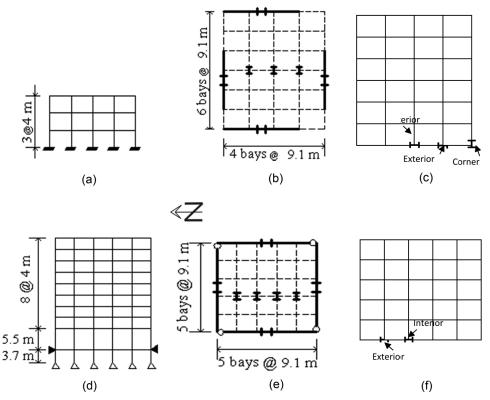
Elevations, plan and element location for Models 1 and 2 (a) Elevation Model 1, (b) Plan Model 1, (c) Studied elements for Model 1, (d) Elevation Model 2, (e) Plan Model 2 and (f) Studied elements for Model 2
